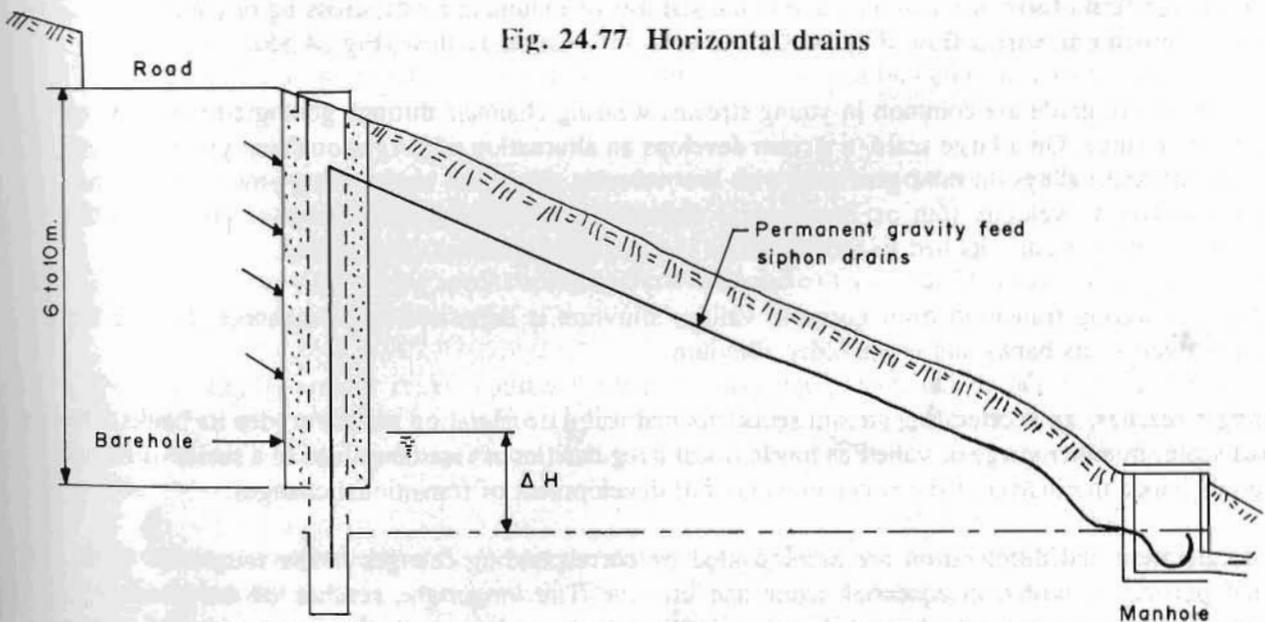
Planning of horizontal drains in landslide areas, plan of drains not shown
